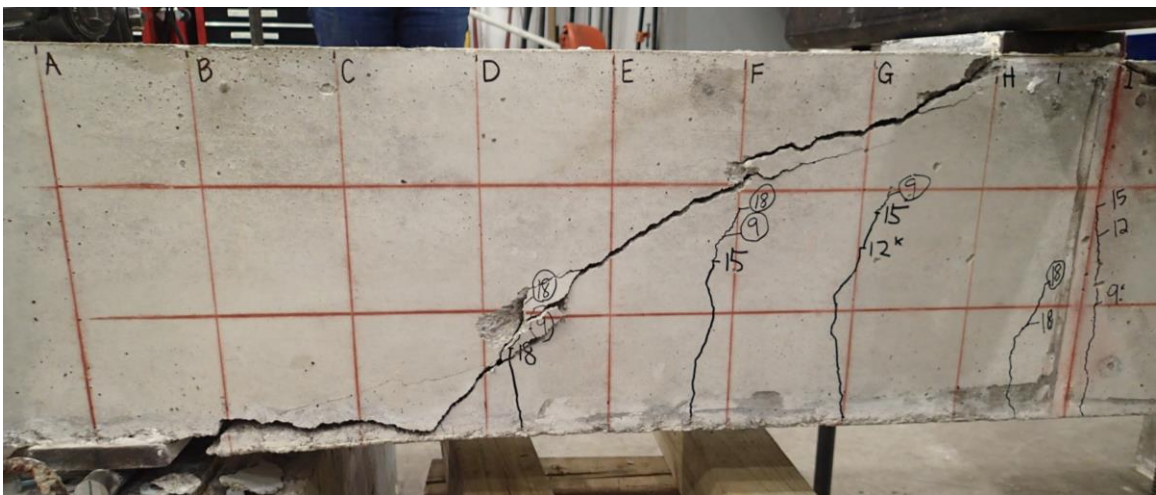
Specimen I-1: North Side Failure Inclined Crack
